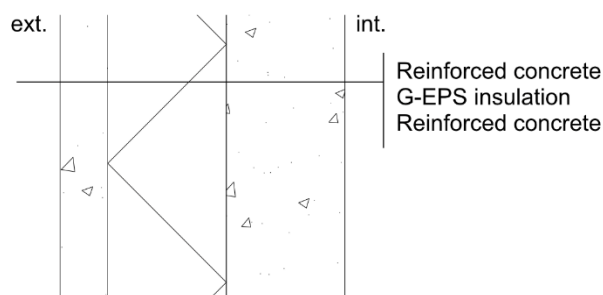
A section of the thermal envelope of the insulated concrete sandwich panel.
